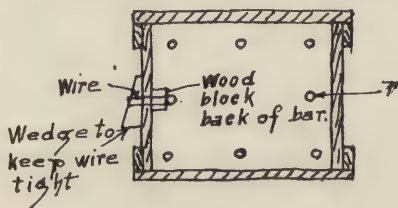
Showing method of supporting reinforcing when putting up a column. Wood blocks are removed as each section of column is filled.
